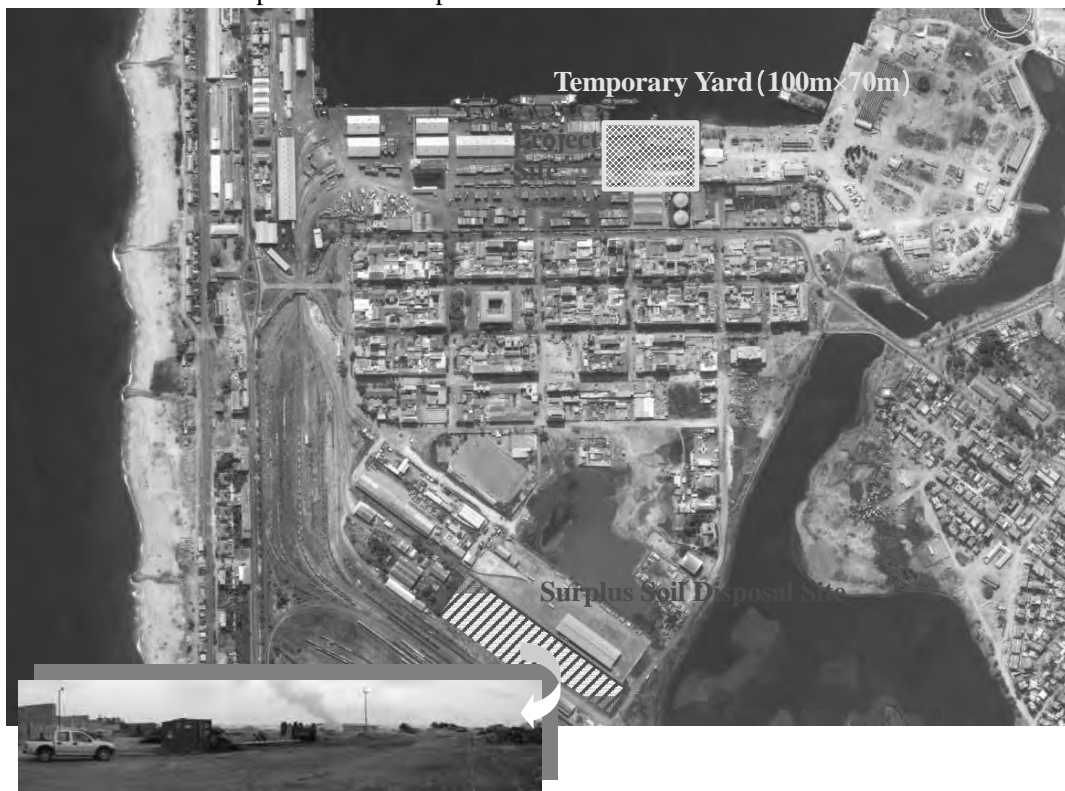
(4) Temporary Yard and Surplus Disposal Site
